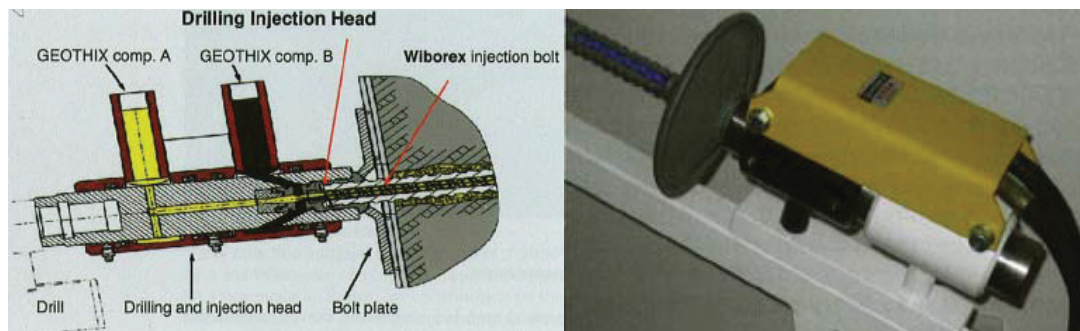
The sectional view and picture of the drilling and Injection adapter for One-Step procedure [42]
